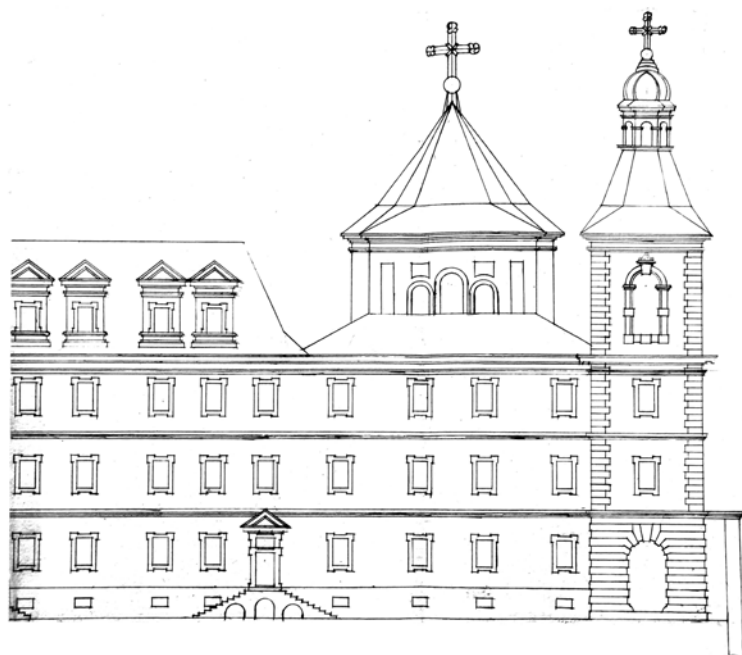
Simon Pitz, design for the Jesuit church and college in Königgrätz, elevation, AKJK, photo: K. Blaschke
